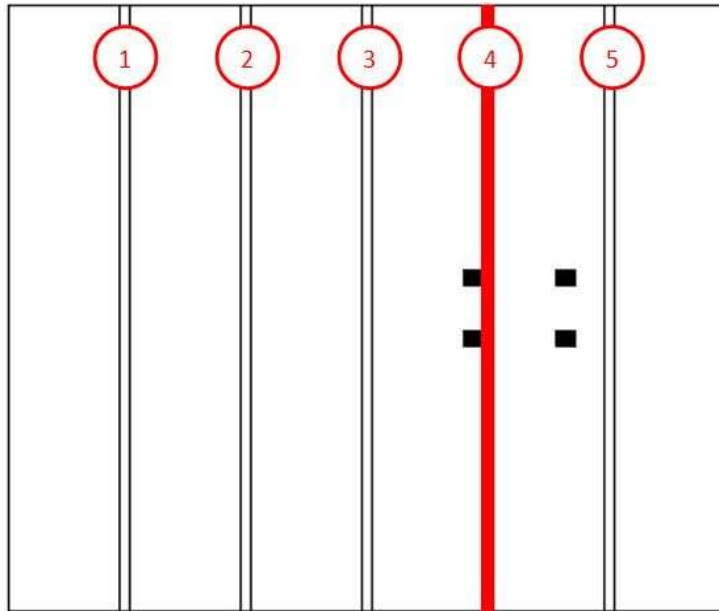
Critical load location for positive moment for an eight-foot section NEXT-D bridge
